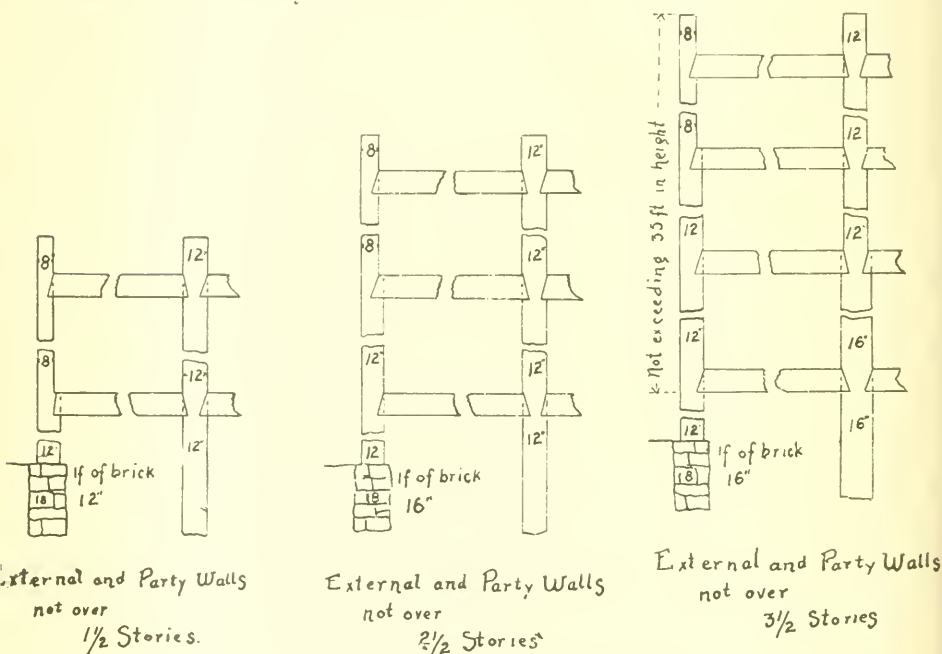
WALLS OF BRICK DWELLINGS.
